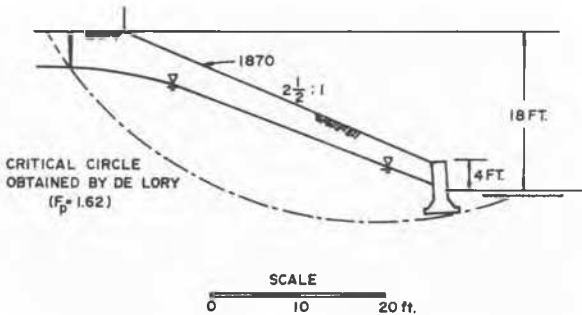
SECTION THROUGH SLIDE IN UPPER HOLLOWAY CUTTING (AFTER DE LORY 1957)
